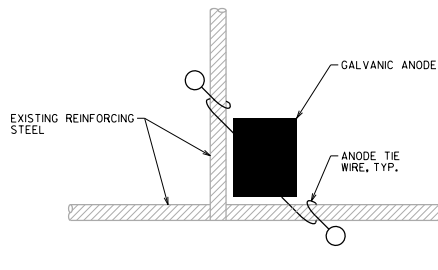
DETAILS APPLICABLE TO ALL OVERLAY METHODS AND DECK REPAIRS WITHOUT OVERLAYS.
